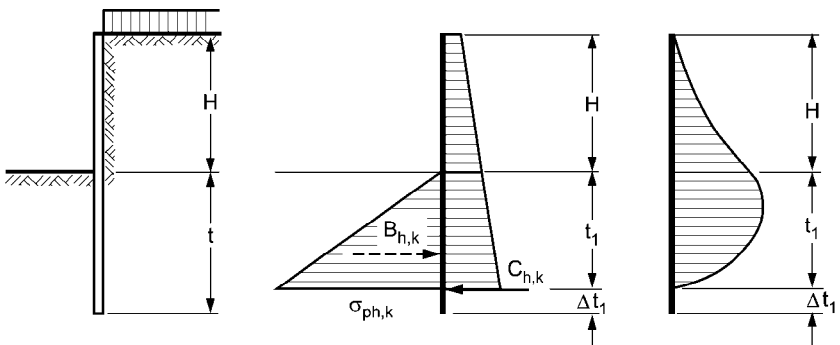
System, load and moment distribution for an unsupported soldier pile wall or in-situ concrete wall fixed in the ground
